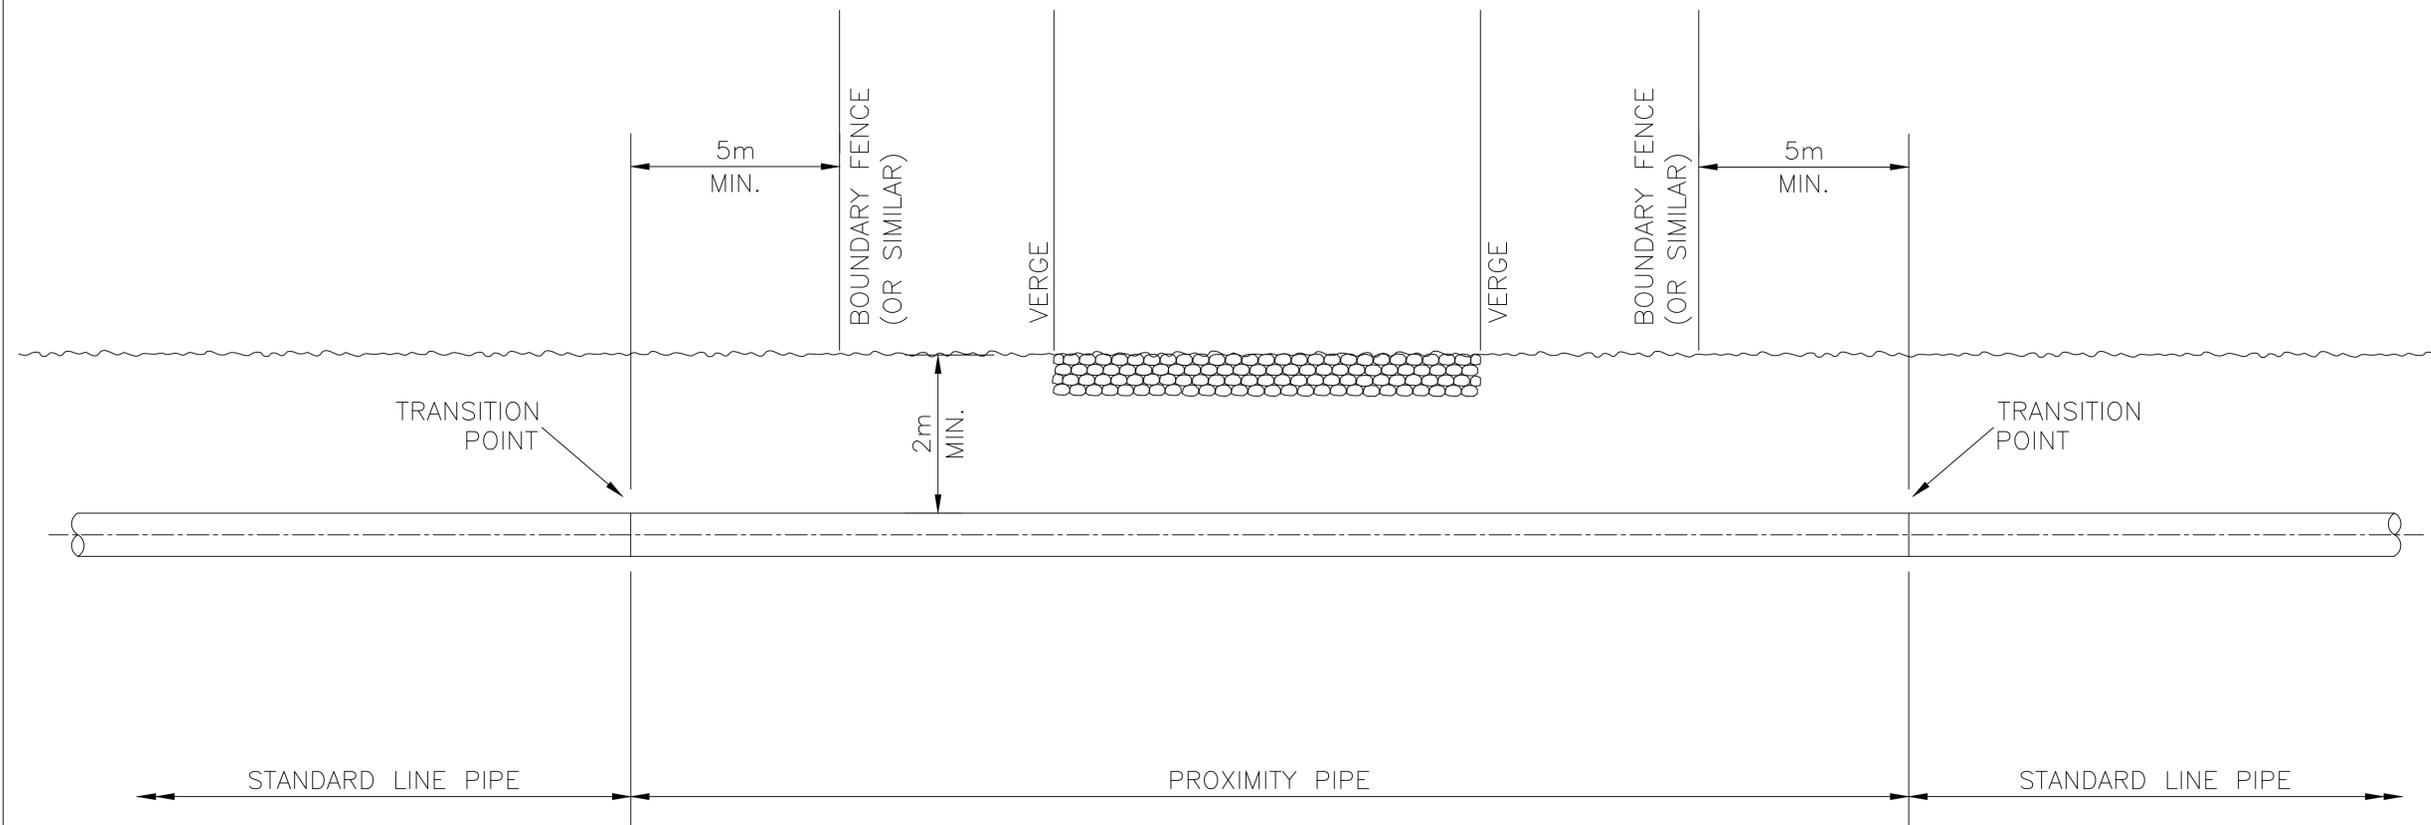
MINOR ROAD AND TRACK CROSSING
